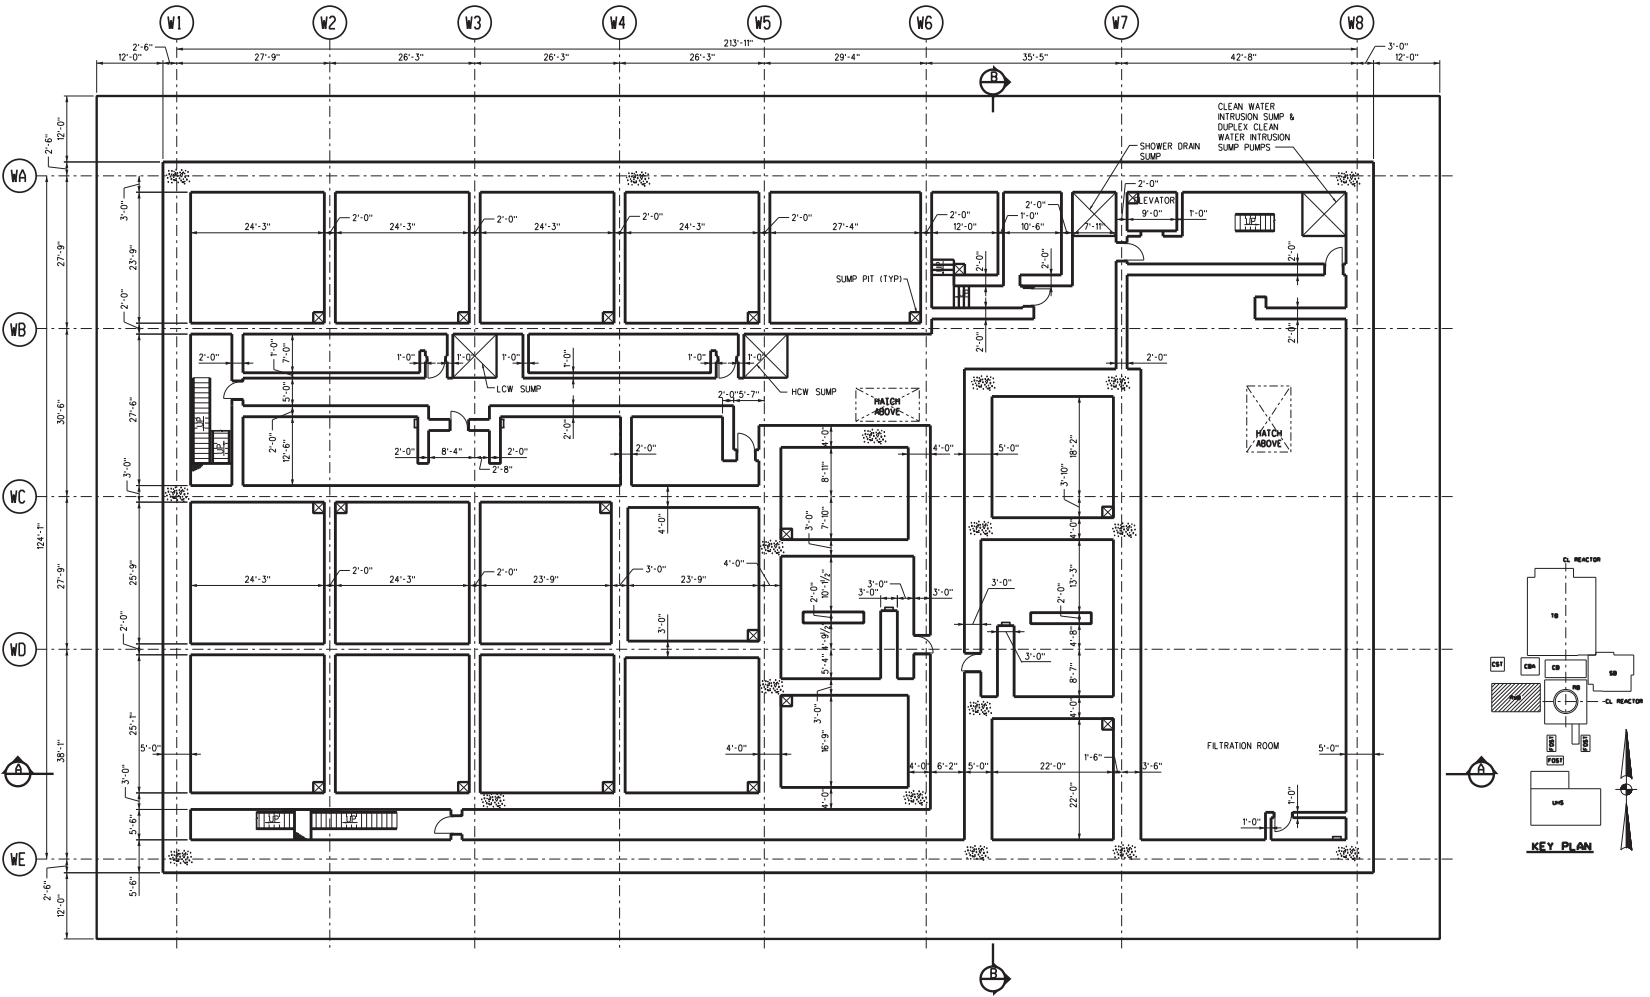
H.3-54 Radwaste Building Floor Plan at Elevation -11'-0"
